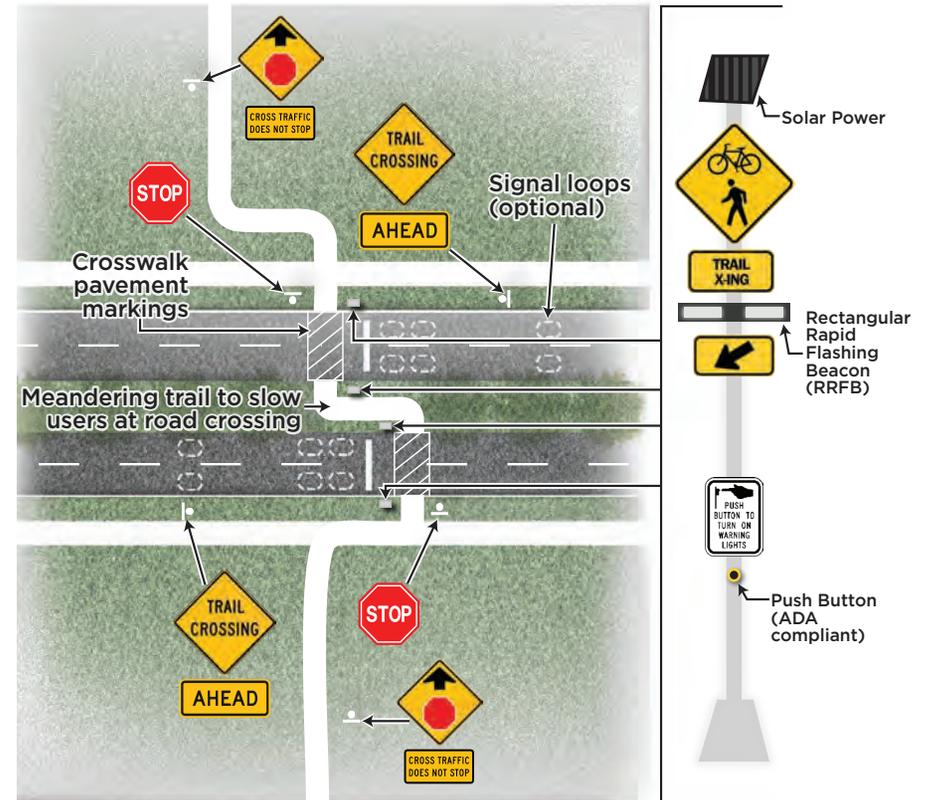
, Typical Mid-Block Trail Crossing at Roadway Intersection
